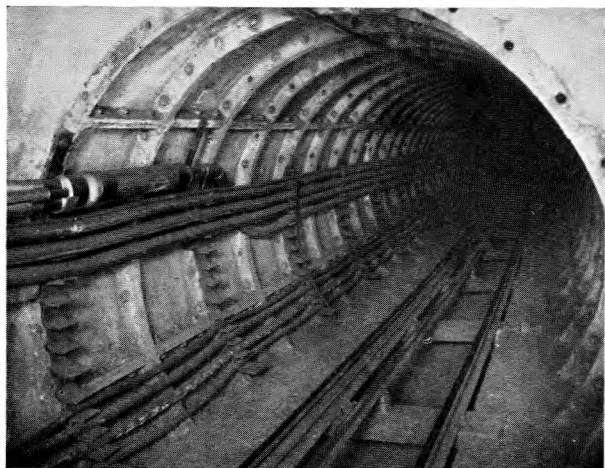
VIEW IN POST OFFICE RAILWAY TUNNEL SHOWING CABLE BEARERS AND LOCKING BAR.
